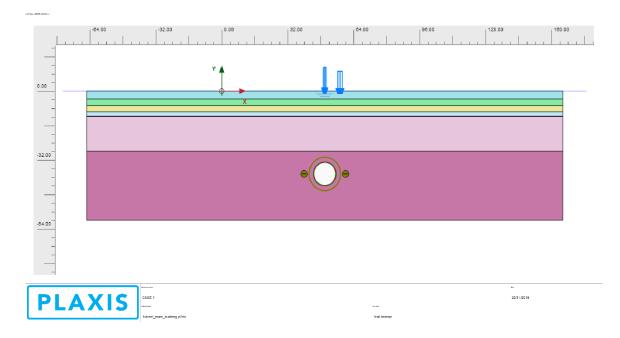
CASE 1 – Tunnel under 1st footing of the building
